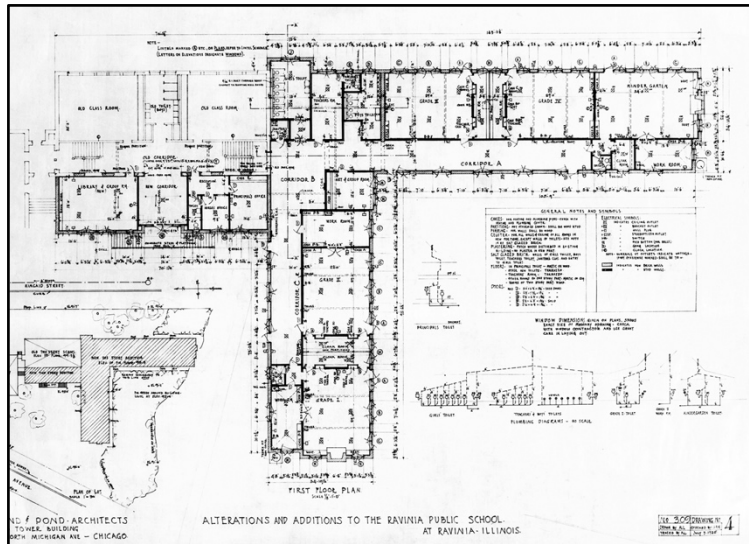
Original Pond & Pond first floor plan. From the Ryerson and Burnham Art and Architecture Archives.
